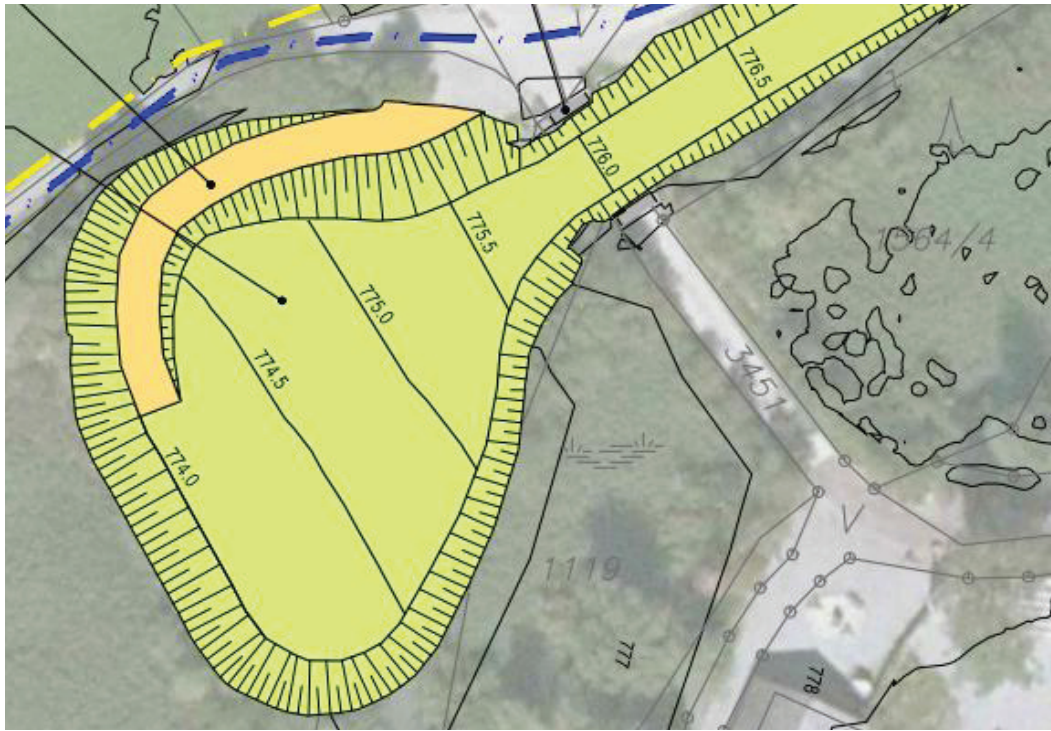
Plan view of sediment trap at the reservoir head. Flow from upper right to lower left.
